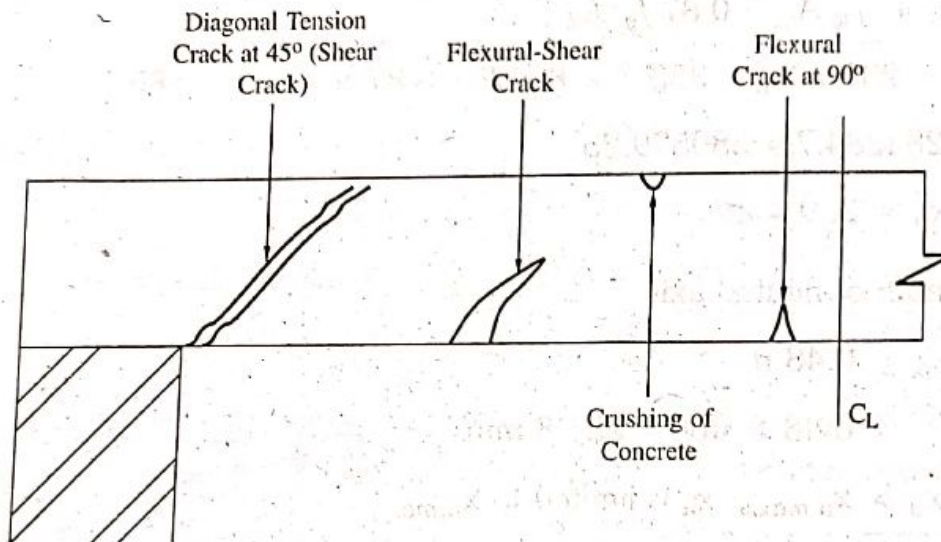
Crack Pattern in Beams (Simply Supported Beam)
